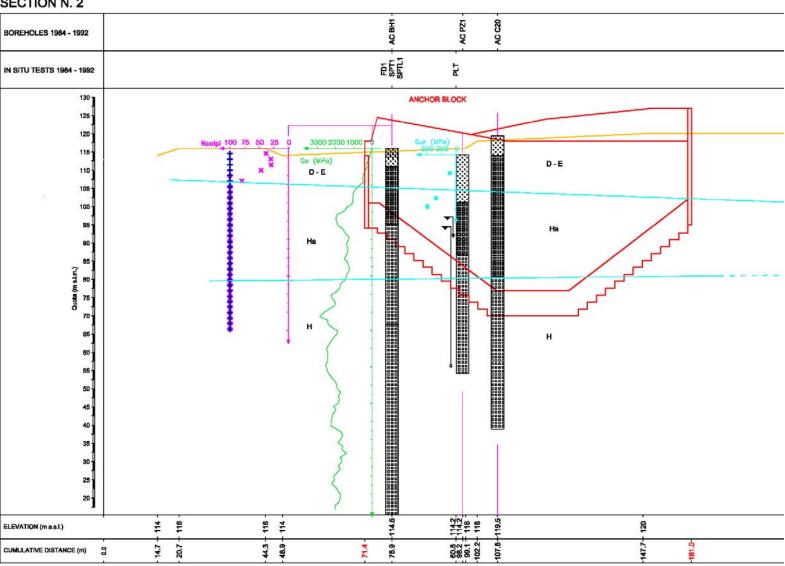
Calabria Anchor Block, longitudinal section (Section No. 2)
